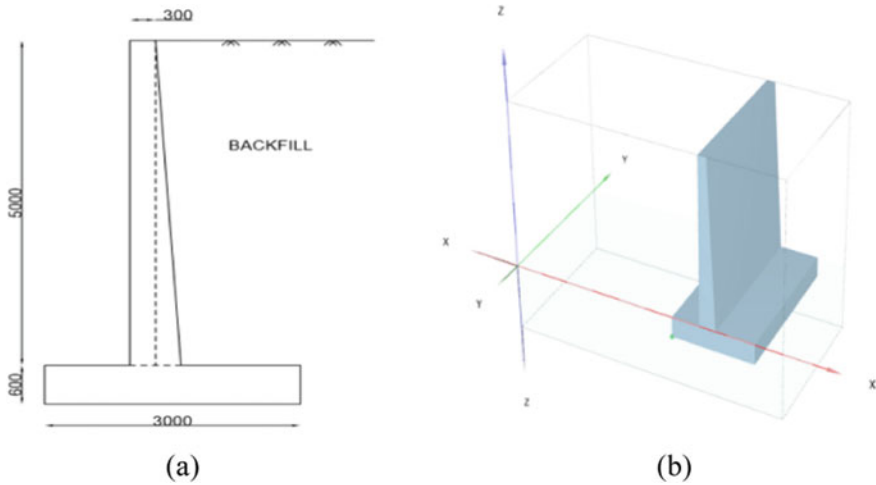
a Cross-sectional view of a wall. b 3D numerical model of retaining wall
